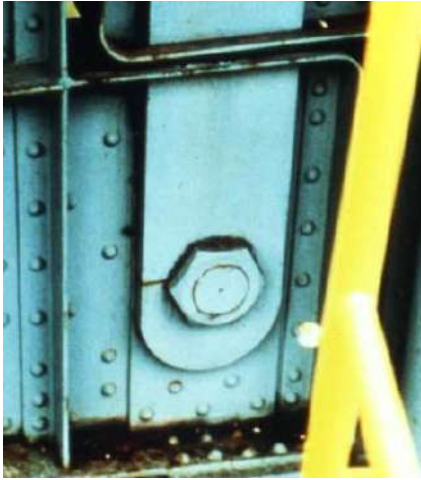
Wear, fatigue, corrosion of pin/hanger
